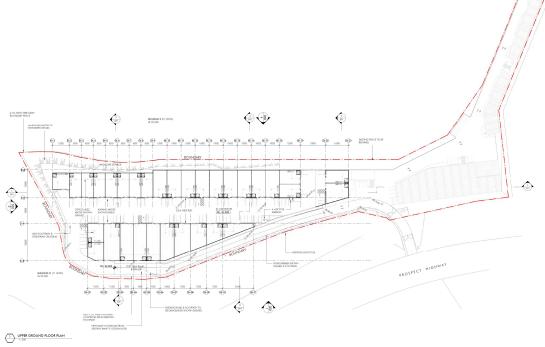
Precinct F Upper Ground Floor Plan – As Proposed (Source: Nettleton Tribe)
